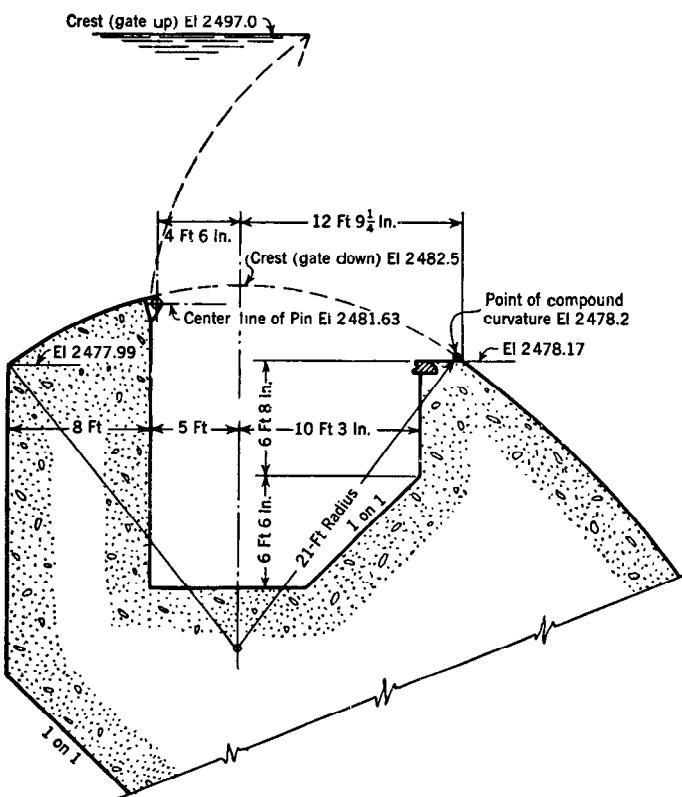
Spillway crest detail, Black Canyon Dam, Idaho. (After Bradley, 1953.)
